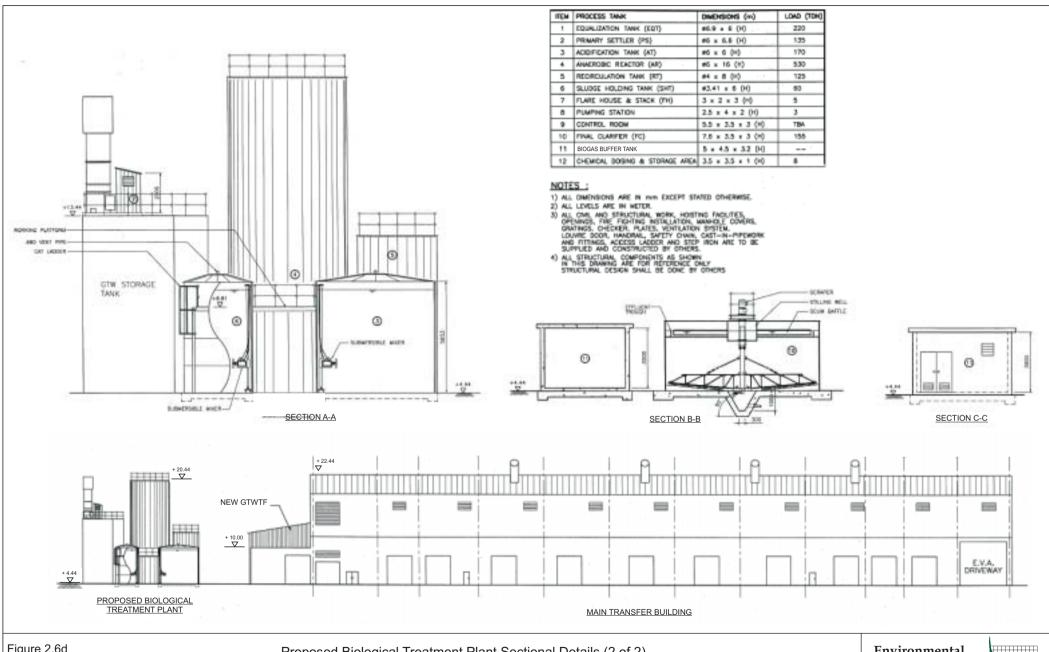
Proposed Biological Treatment Plant Sectional Details (2 of 2)
